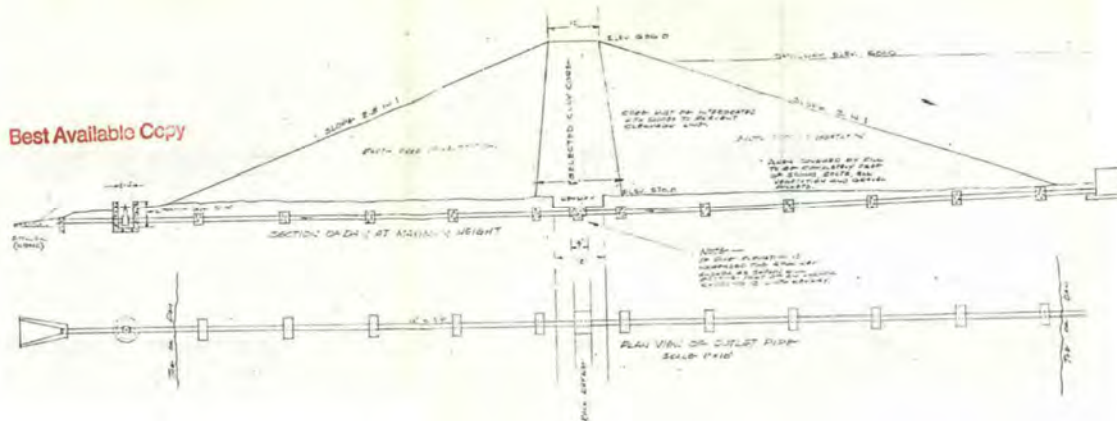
Plan and Cross-Section from 1954 Original Design Drawings
